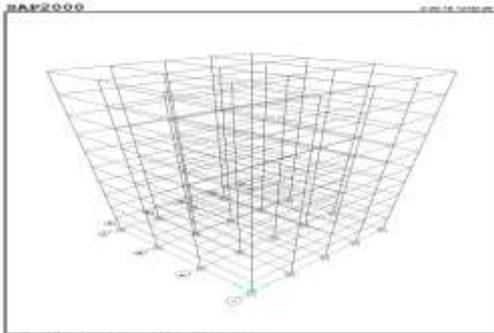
3-D model view of G+10 storey R C building in SAP2000
